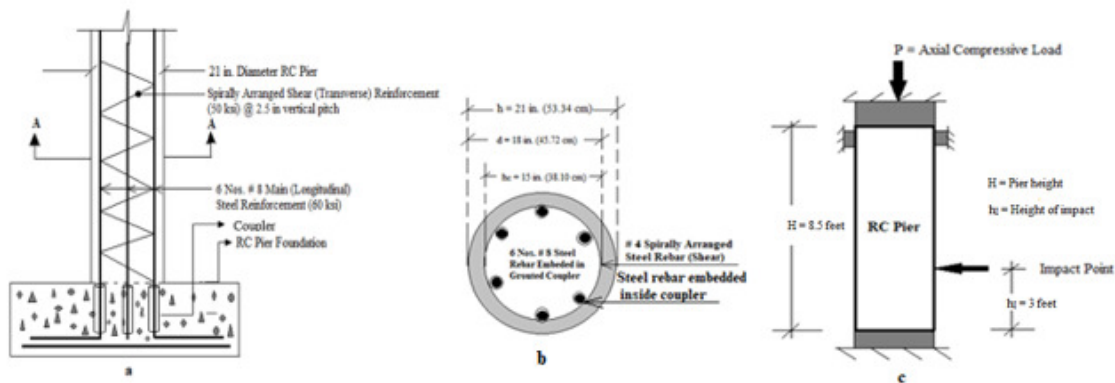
(a) Pier with Grouted coupler (b) Section A-A, and (c) End conditions of pier and impact point.
